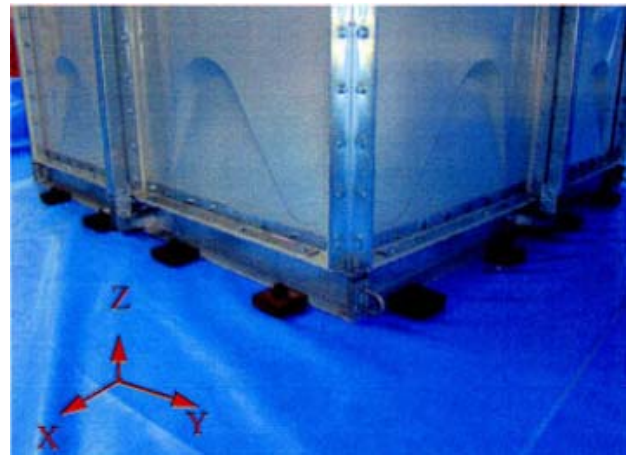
Foundation of the assembly type water storage tank was retained by M20 bolts.
